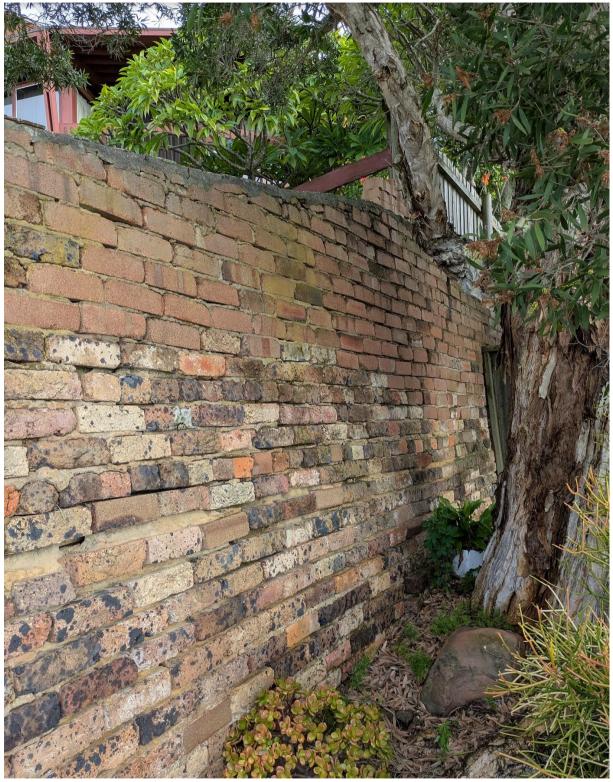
Image of the current masonry retaining wall showing significant erosion of mortar, and a number of large cracks within the wall. Wall shown also in close proximity to tree preventing works.
